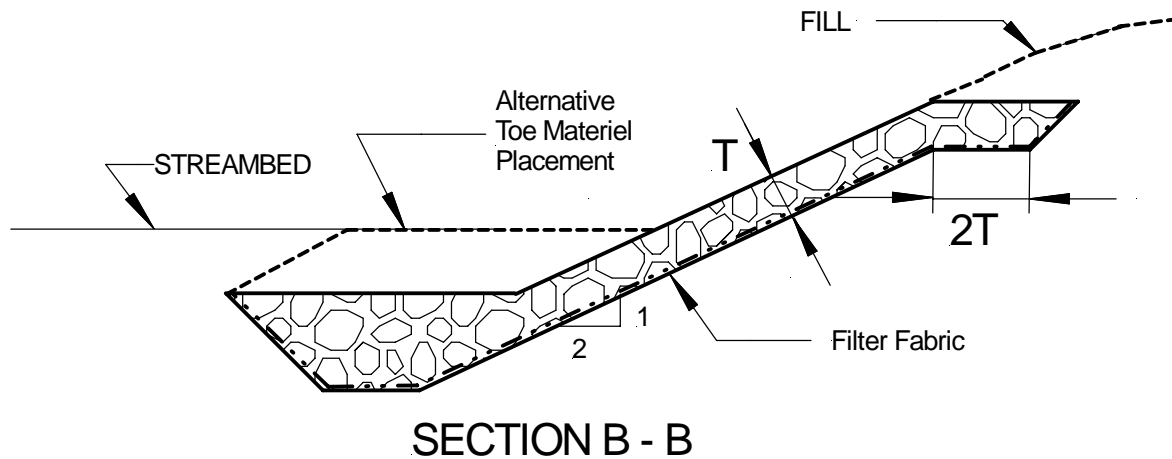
Typical Riprap Installation: End View (Bank Protection Only)
